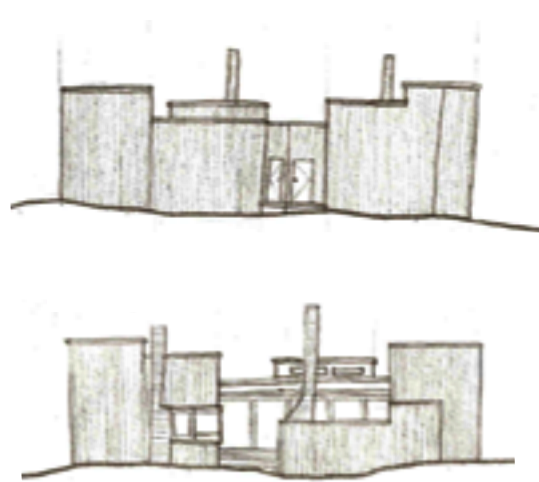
Walker House* by Mitchell and Stout Architects, 2005 (Coromandel Peninsula). Elevations drawn by author.
